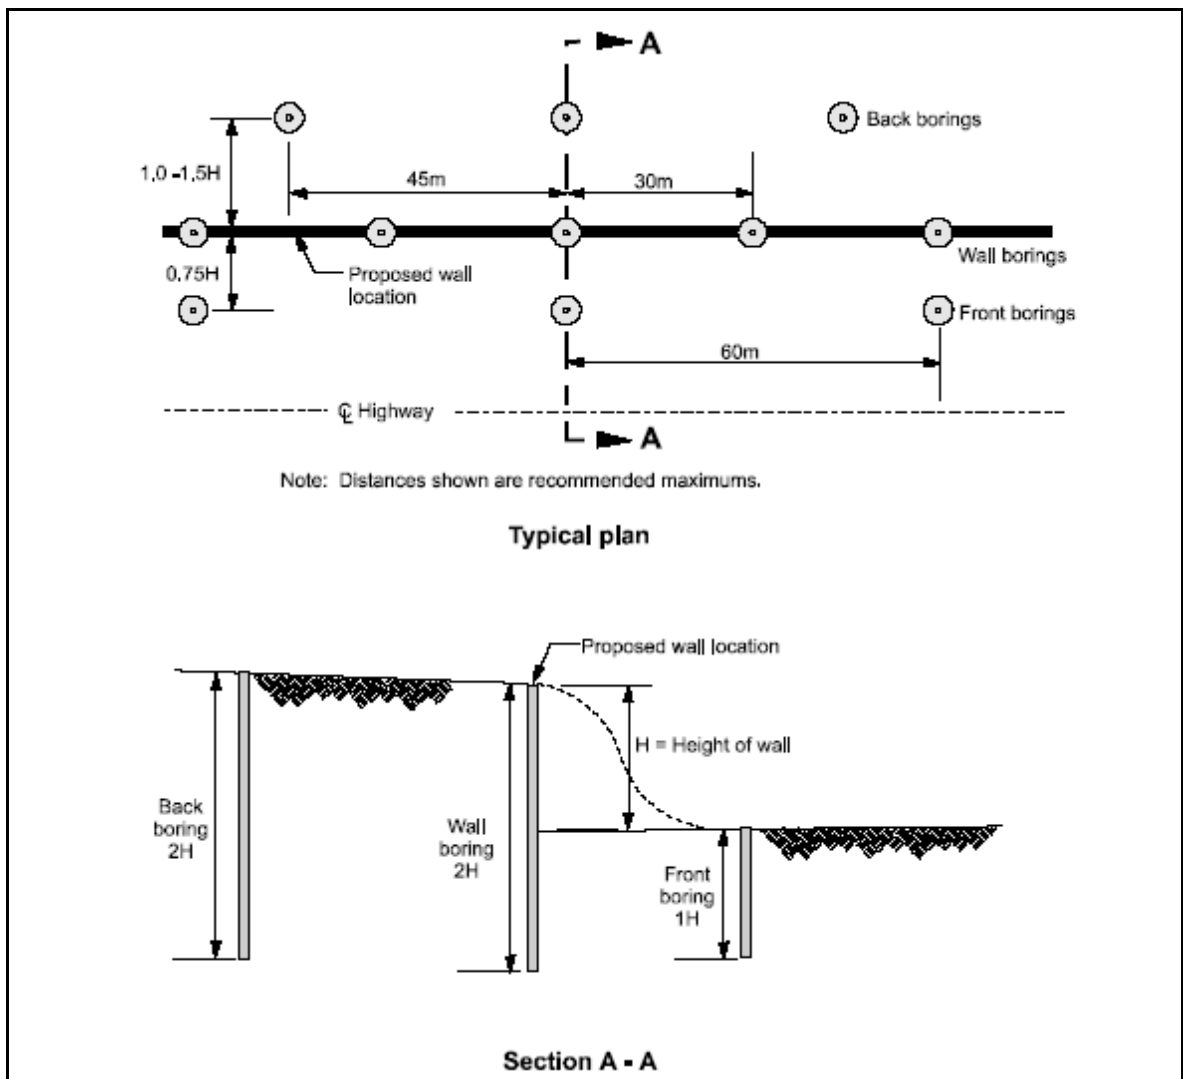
Site exploration guidelines for soil-nailed walls (FHWA, 1998)
